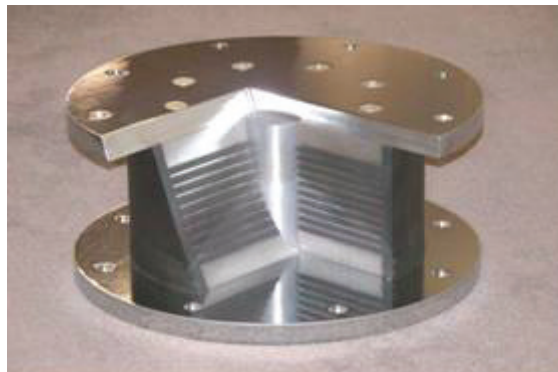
Construction Details for a Lead-Rubber Bearing
